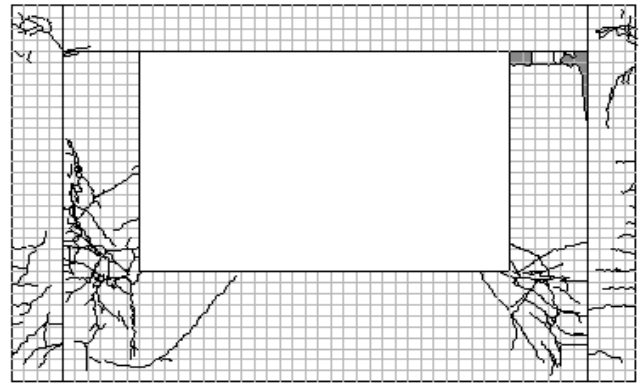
Final Failure of Specimen PR1-UP - Front Side
